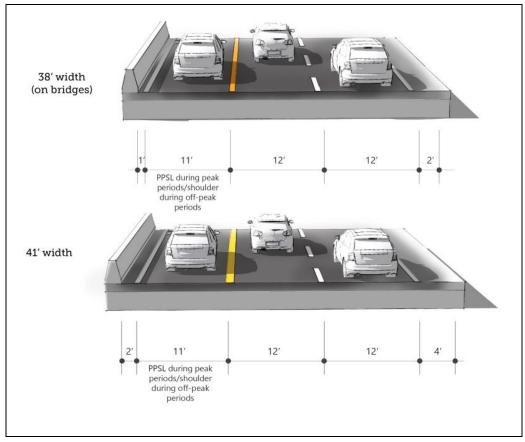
WB PPSL Proposed Action Typical Cross Sections
